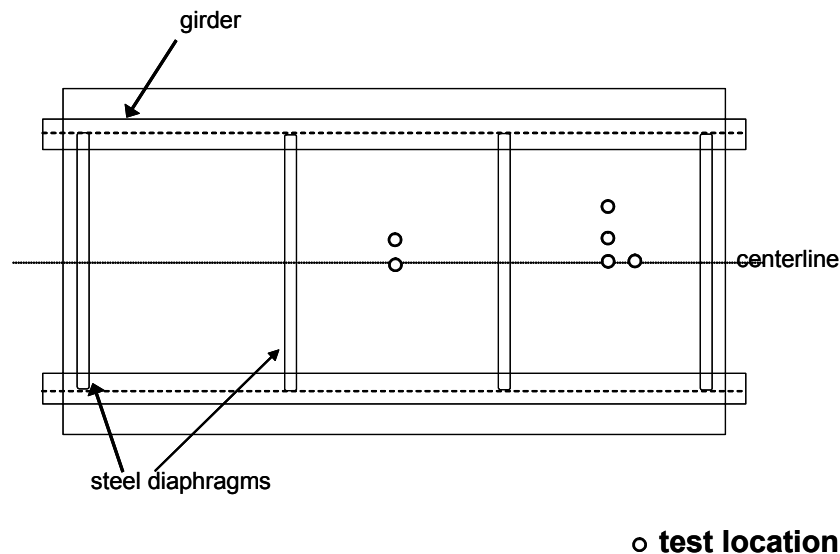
Specimen layout and test locations (Youn and Chang 1998)
